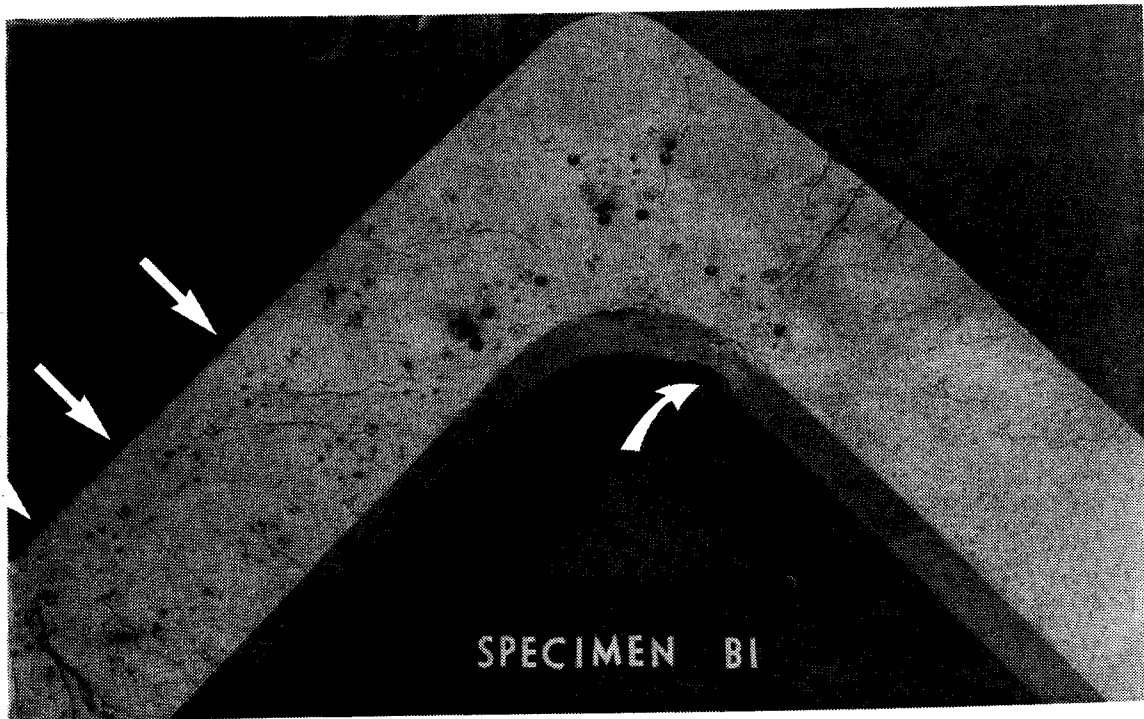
Final Crack Pattern in East Shear Span, Corner, and in Pedestal for Specimen B1
